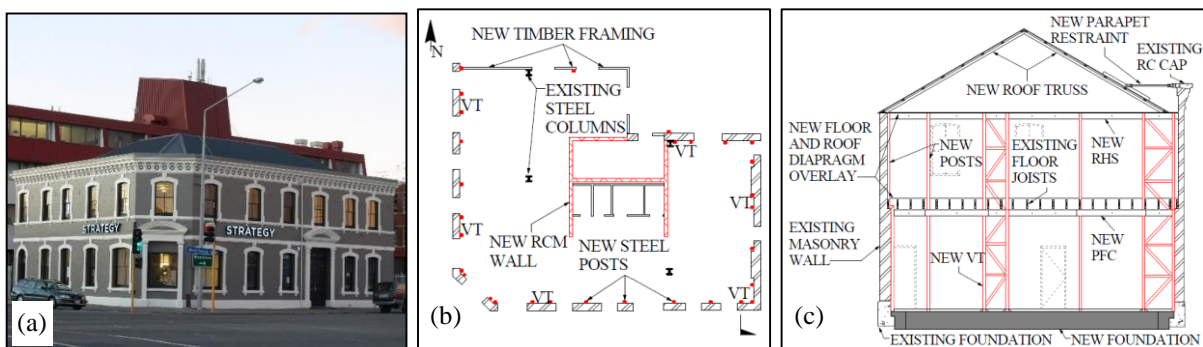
Retrofit of Grosvenor Tavern, 367 Moorhouse Avenue: (a) Exterior view of southwest corner after retrofit; (b) Ground floor plan showing retrofit, VT = vertical truss; (c) East elevation showing retrofit.
